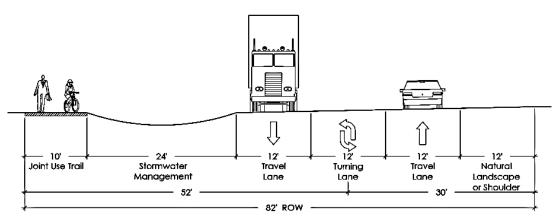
Bell Road (looking north) Cross Section between Fink Road and W. Ike Crow Road
